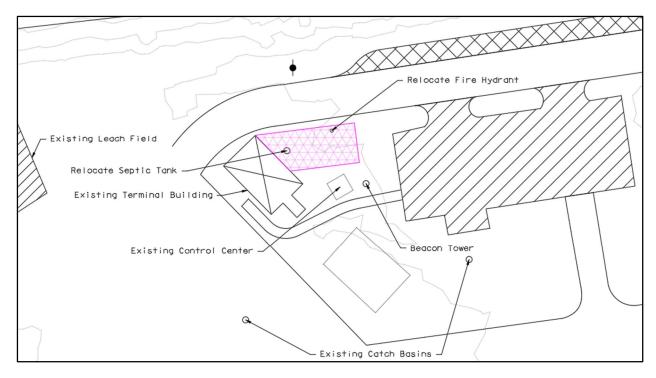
Addition to Old Terminal Building (Alt. 2)
